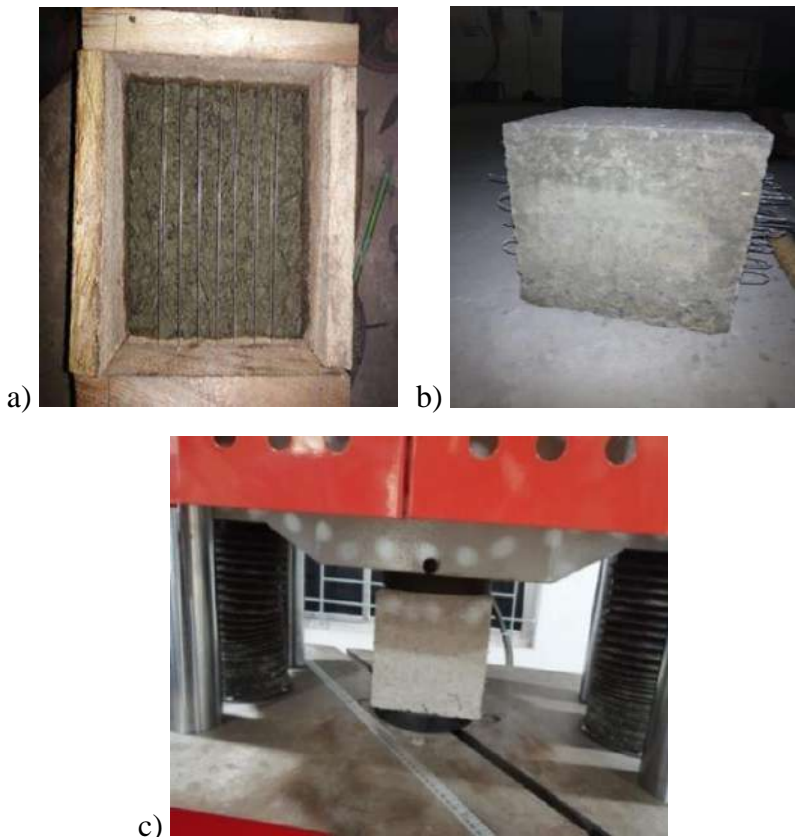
LTC– a) sample preparation, b) hardened concrete, c) compressive strength test
